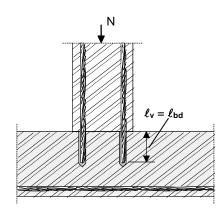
Anchoring of reinforcement to cover the line of acting tensile force
